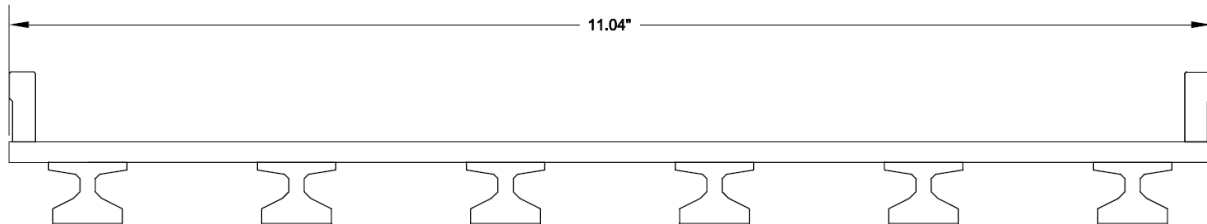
Bridge Model 1: 46' wide deck with six TX-28 girders
